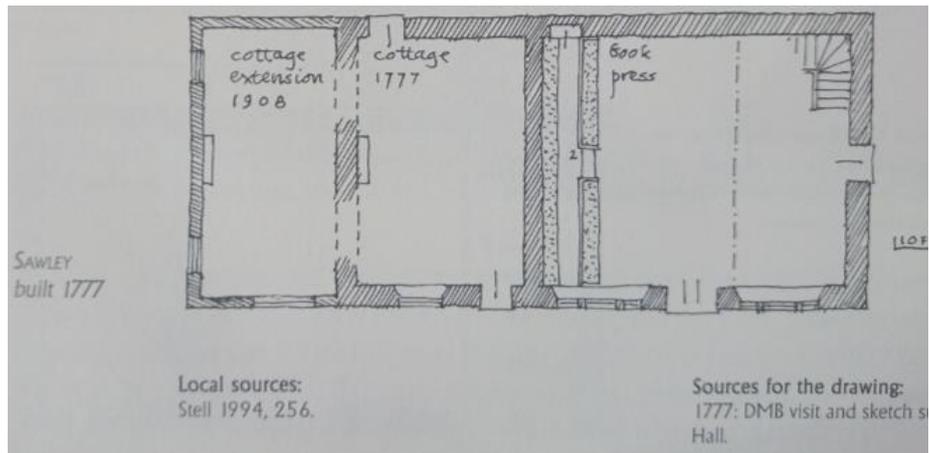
Plan of the meeting house (Butler, 1999, p.826). Not to scale. North is at the top
